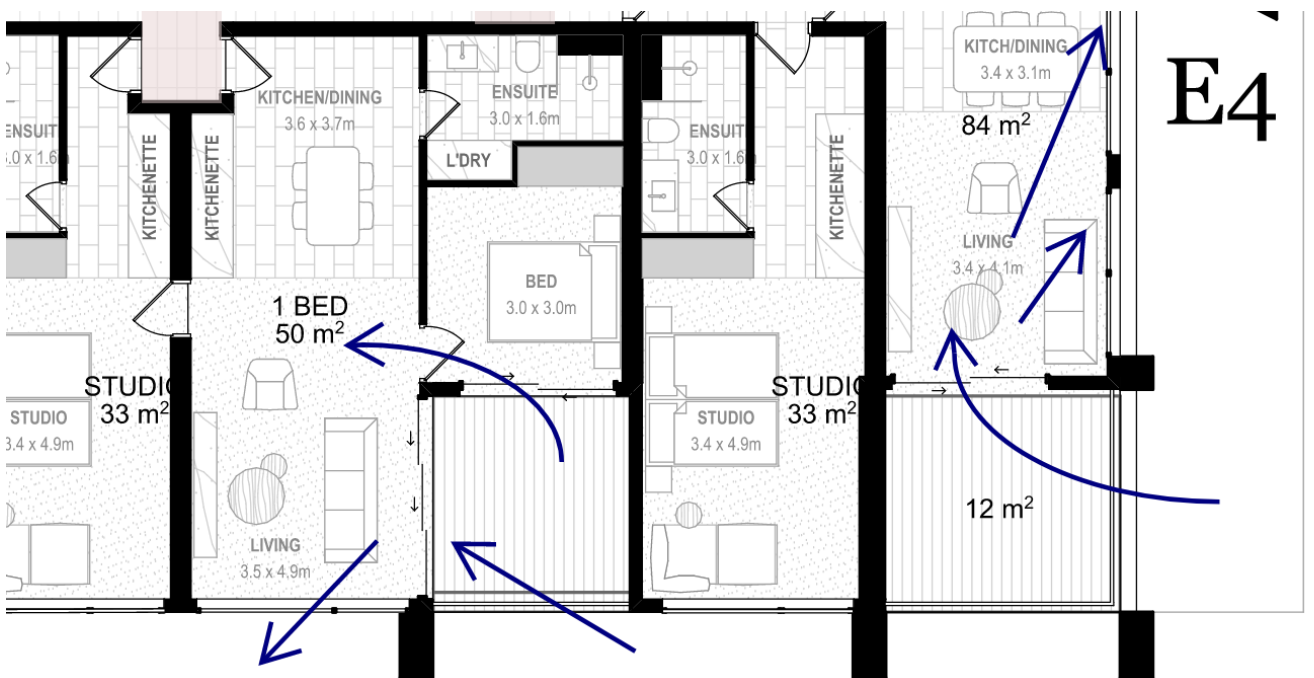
An example wind path for apartments with façade opening enabling cross ventilation.
